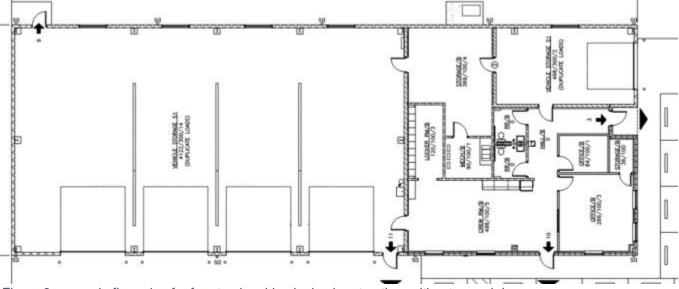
; example floor plan for four trucks, drive-in, back-out option, without a wash bay.
